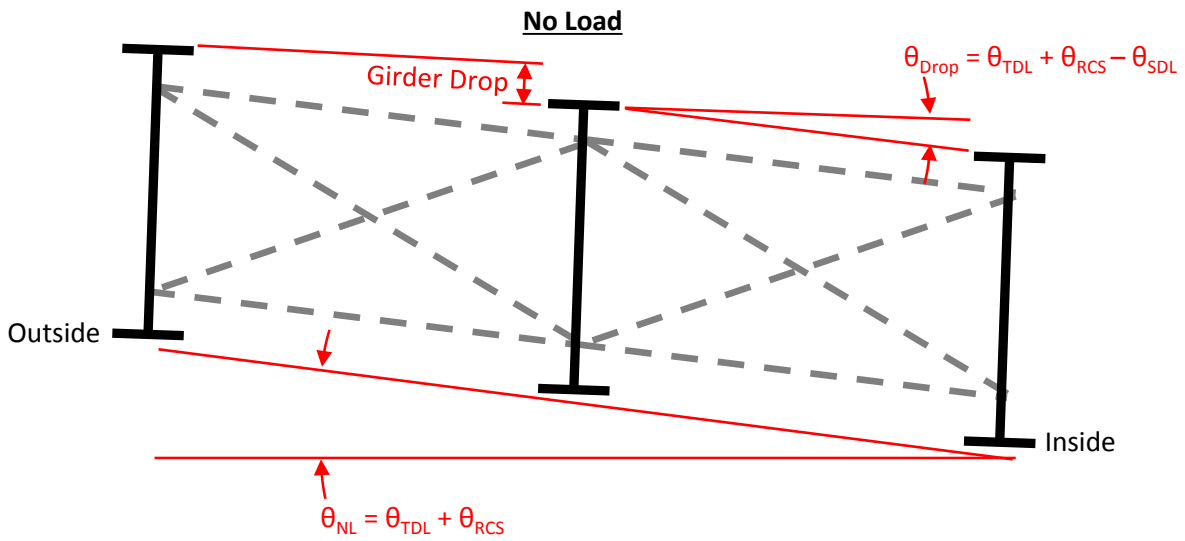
No Load – Steel I-Girder System Twist SDF – Section A-A
